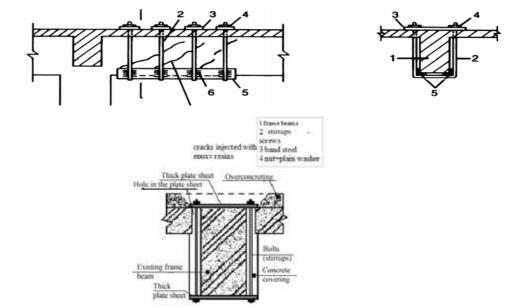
Local intervention details with regard to the capacity in shear of the frame reinforced concrete beams
